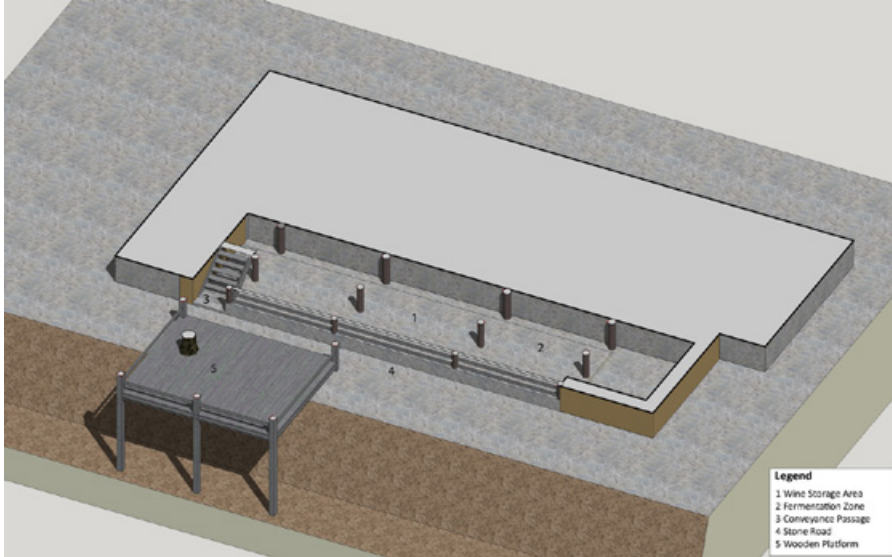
Ground floor of the brewing workshop. (Source: Author)
